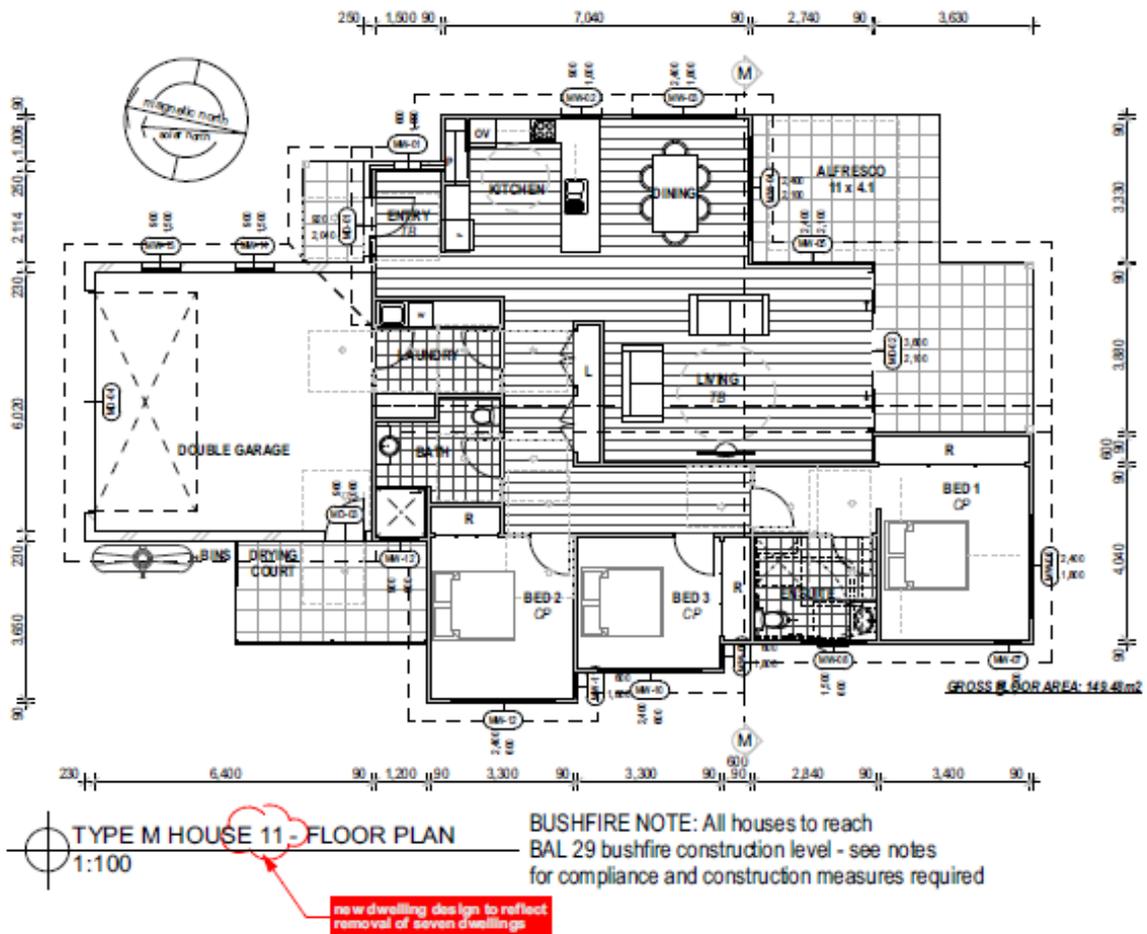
Proposed Housing Type M Floor Plan (Dwelling 23)
